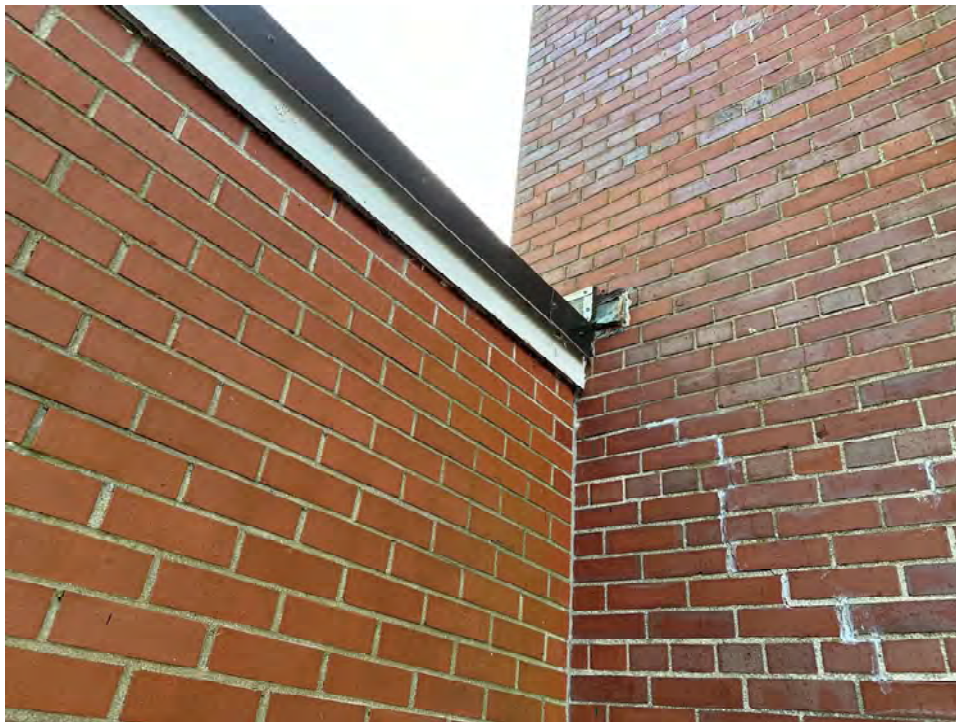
Newer roof flashing at top of west elevation wall at transition to Old Fire Hall building
